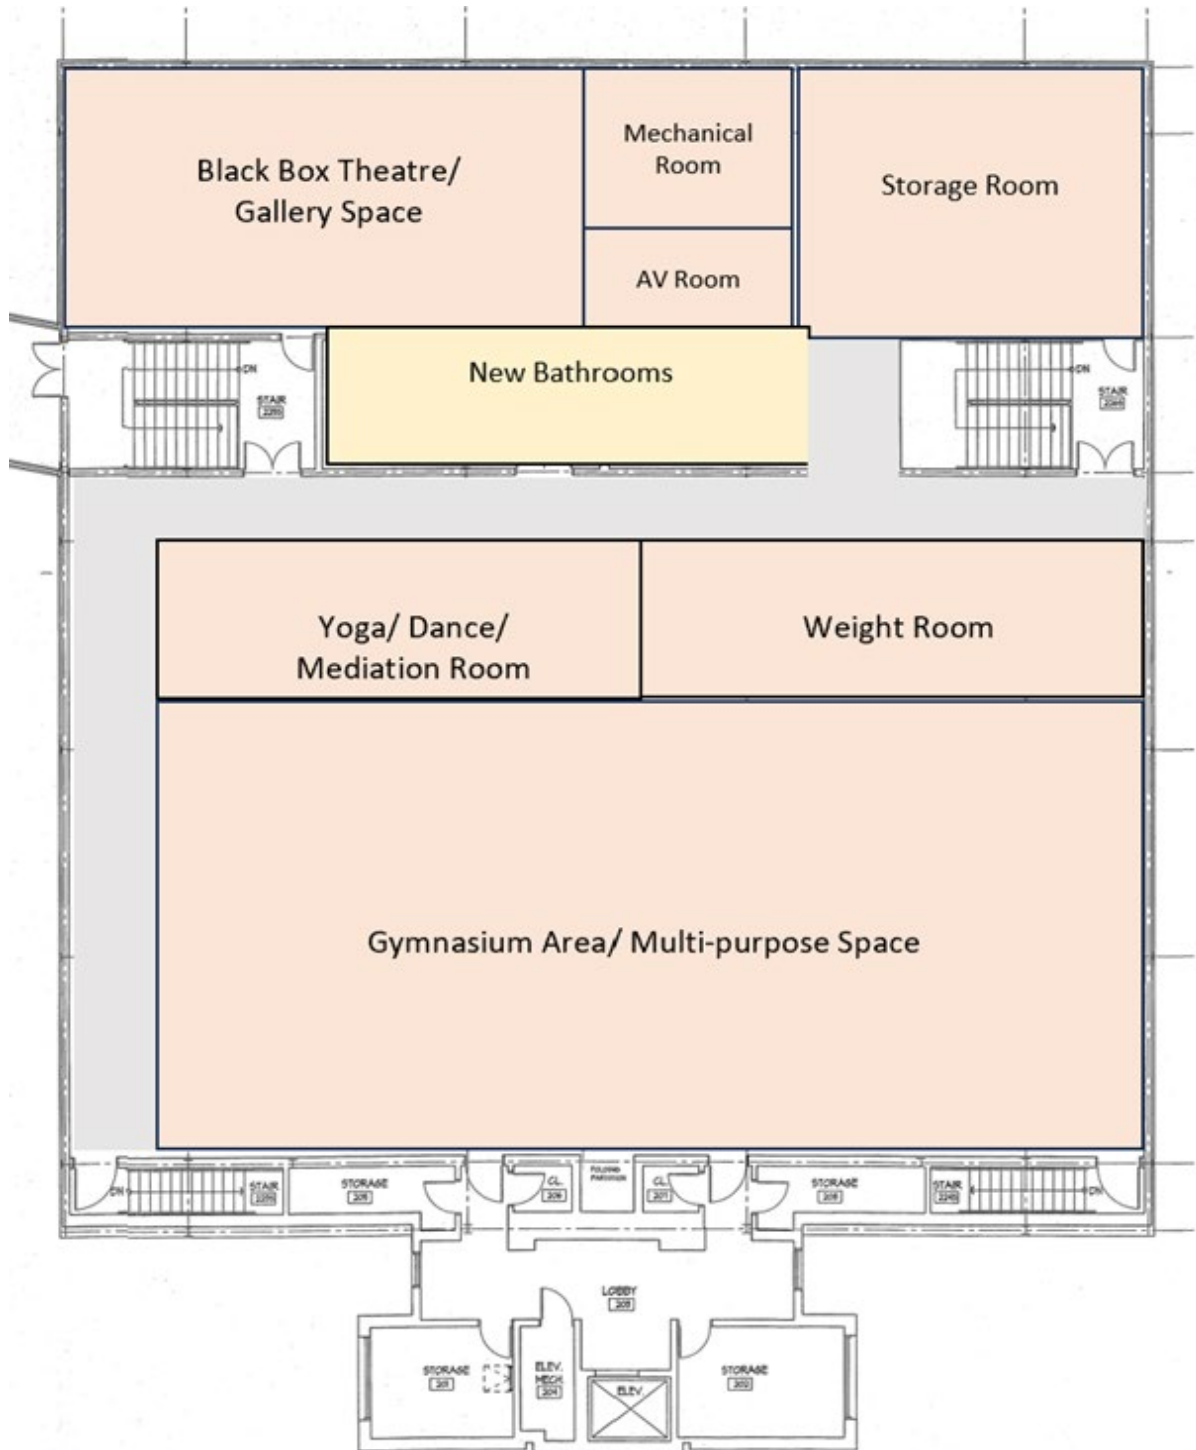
EXHIBIT C: NON-ARCHITECTURAL CONCEPT PLANS
